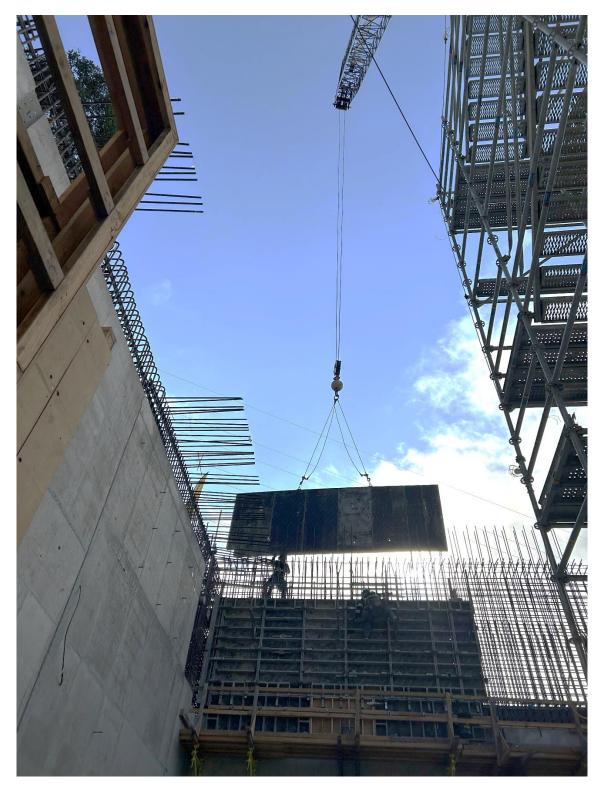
Carpenters lowering an engineered concrete form into position at the divider wall between the Chlorine Contact Basin and the UV Room in the UV-CCB Facility.
